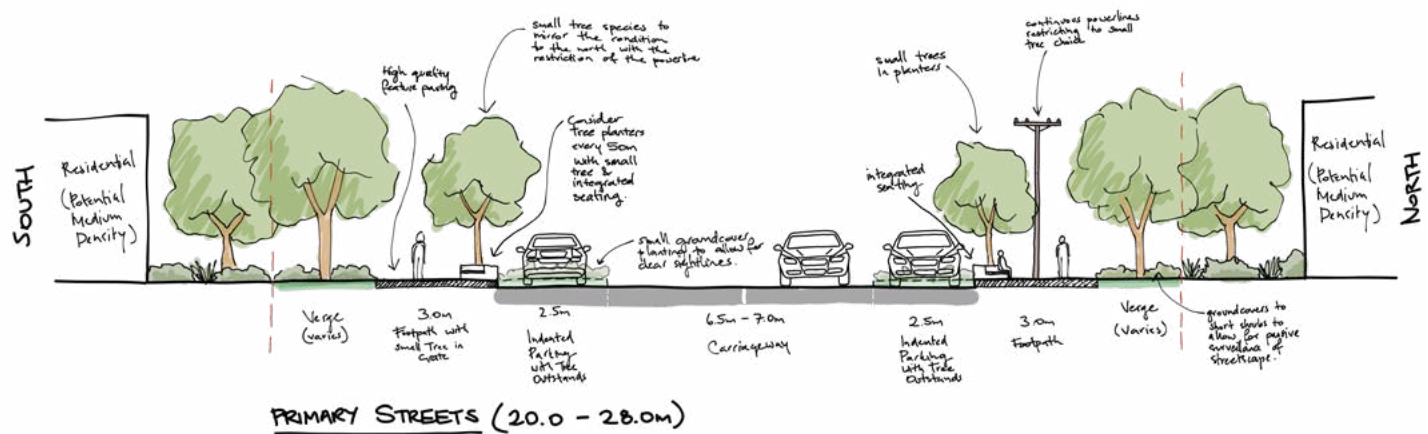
Section B – Primary Streets (Racecourse Road and Andrew Street) – Typical Section
